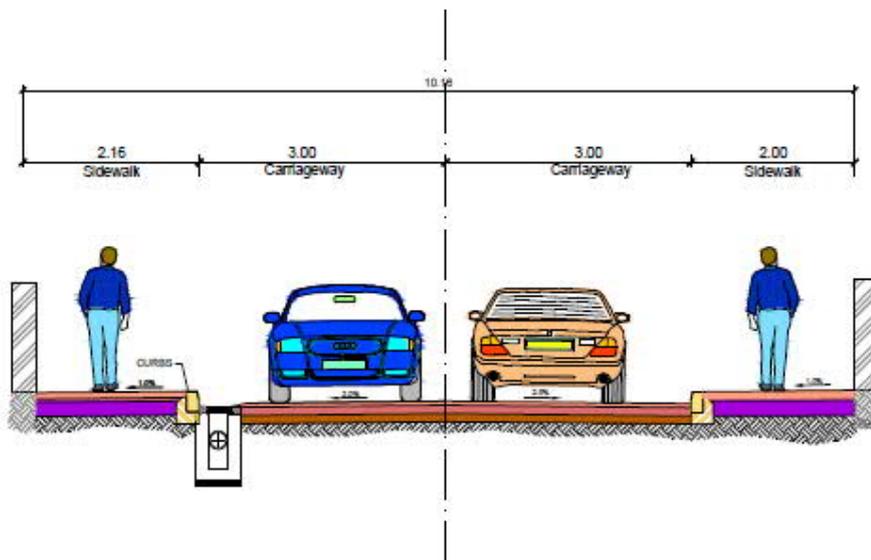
Typical section - Lagarto Bay, Sao Tomé
